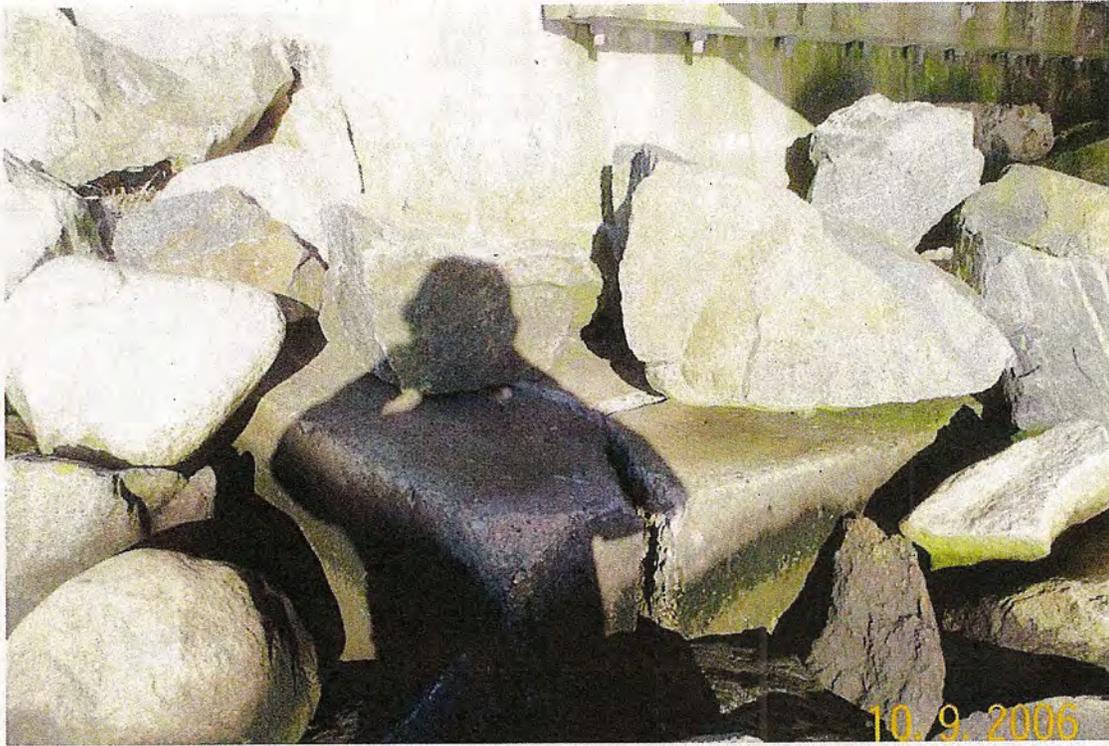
2" wide cracks through the south corner of the west abutment footing, looking northwest.
